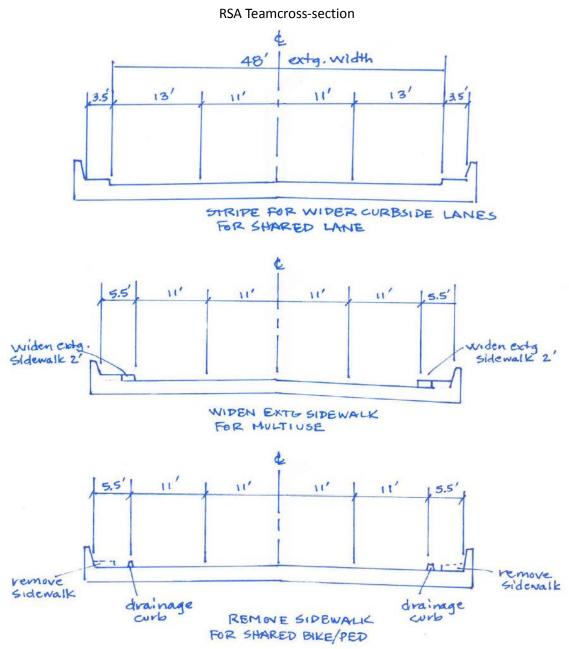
Cross-section options for Bridge over SW Multnomah Boulevard
